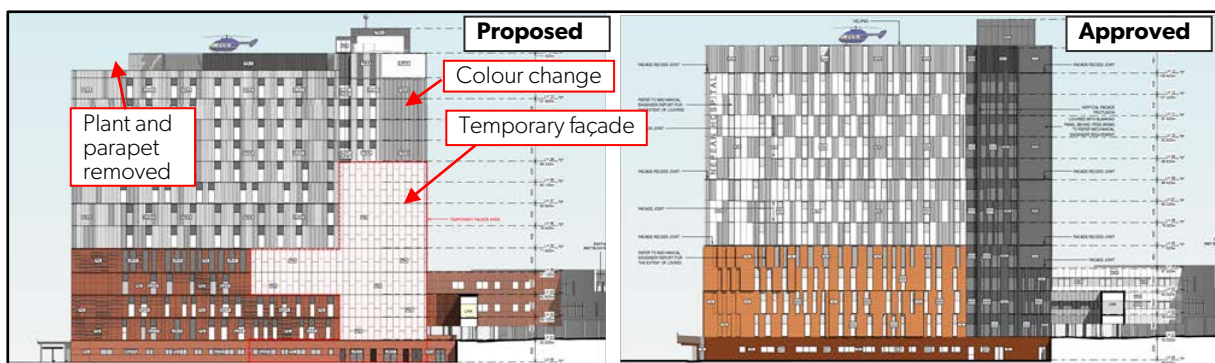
| Proposed (left) and Approved (right) Western Elevation (Source: Modification Application and Approved Plans)
